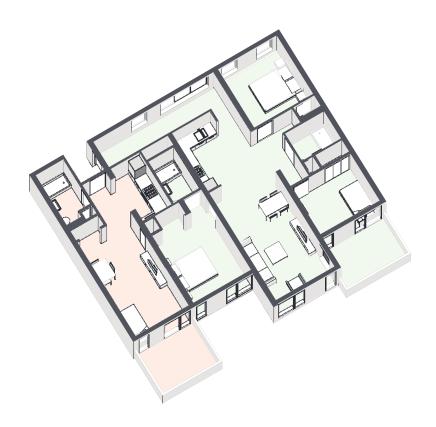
Fifth floor - A studio and a 3-bedroom apartment
